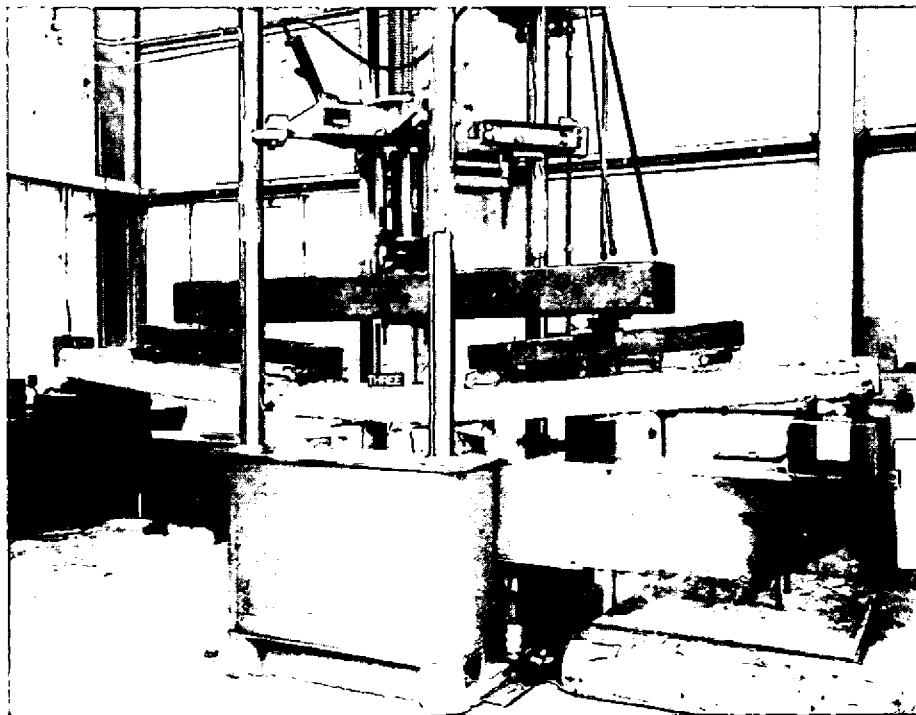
CONTROL ROOF UNIT UNDERGOING HYDRAULIC
